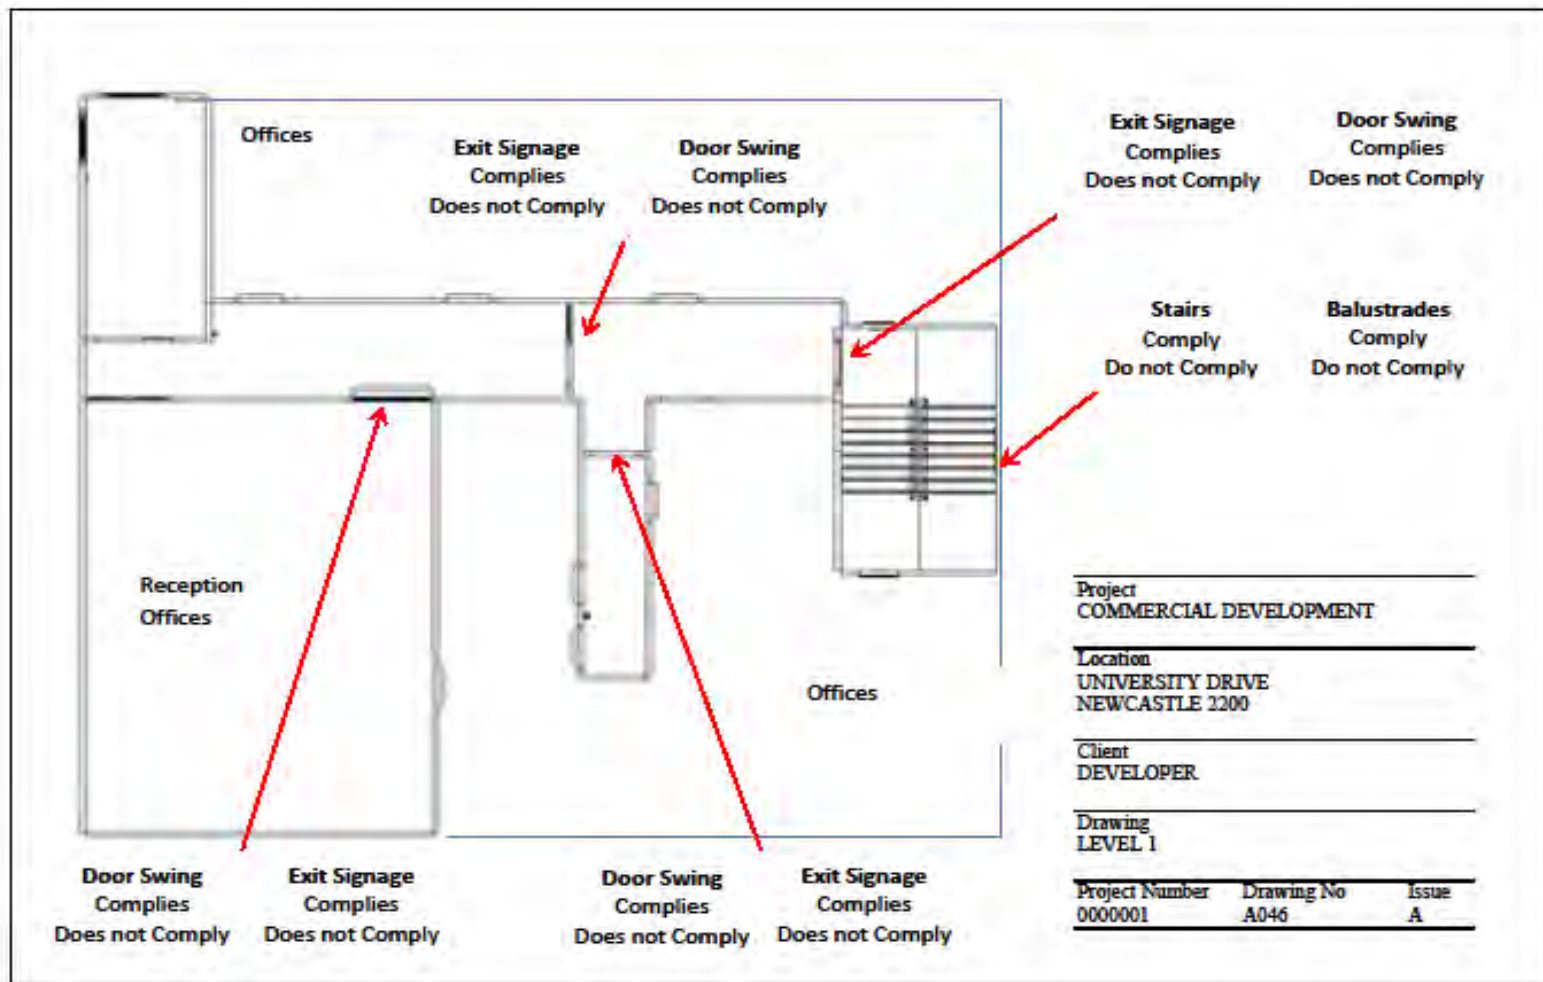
Example extracted floor plan with labelled learning tasks.
